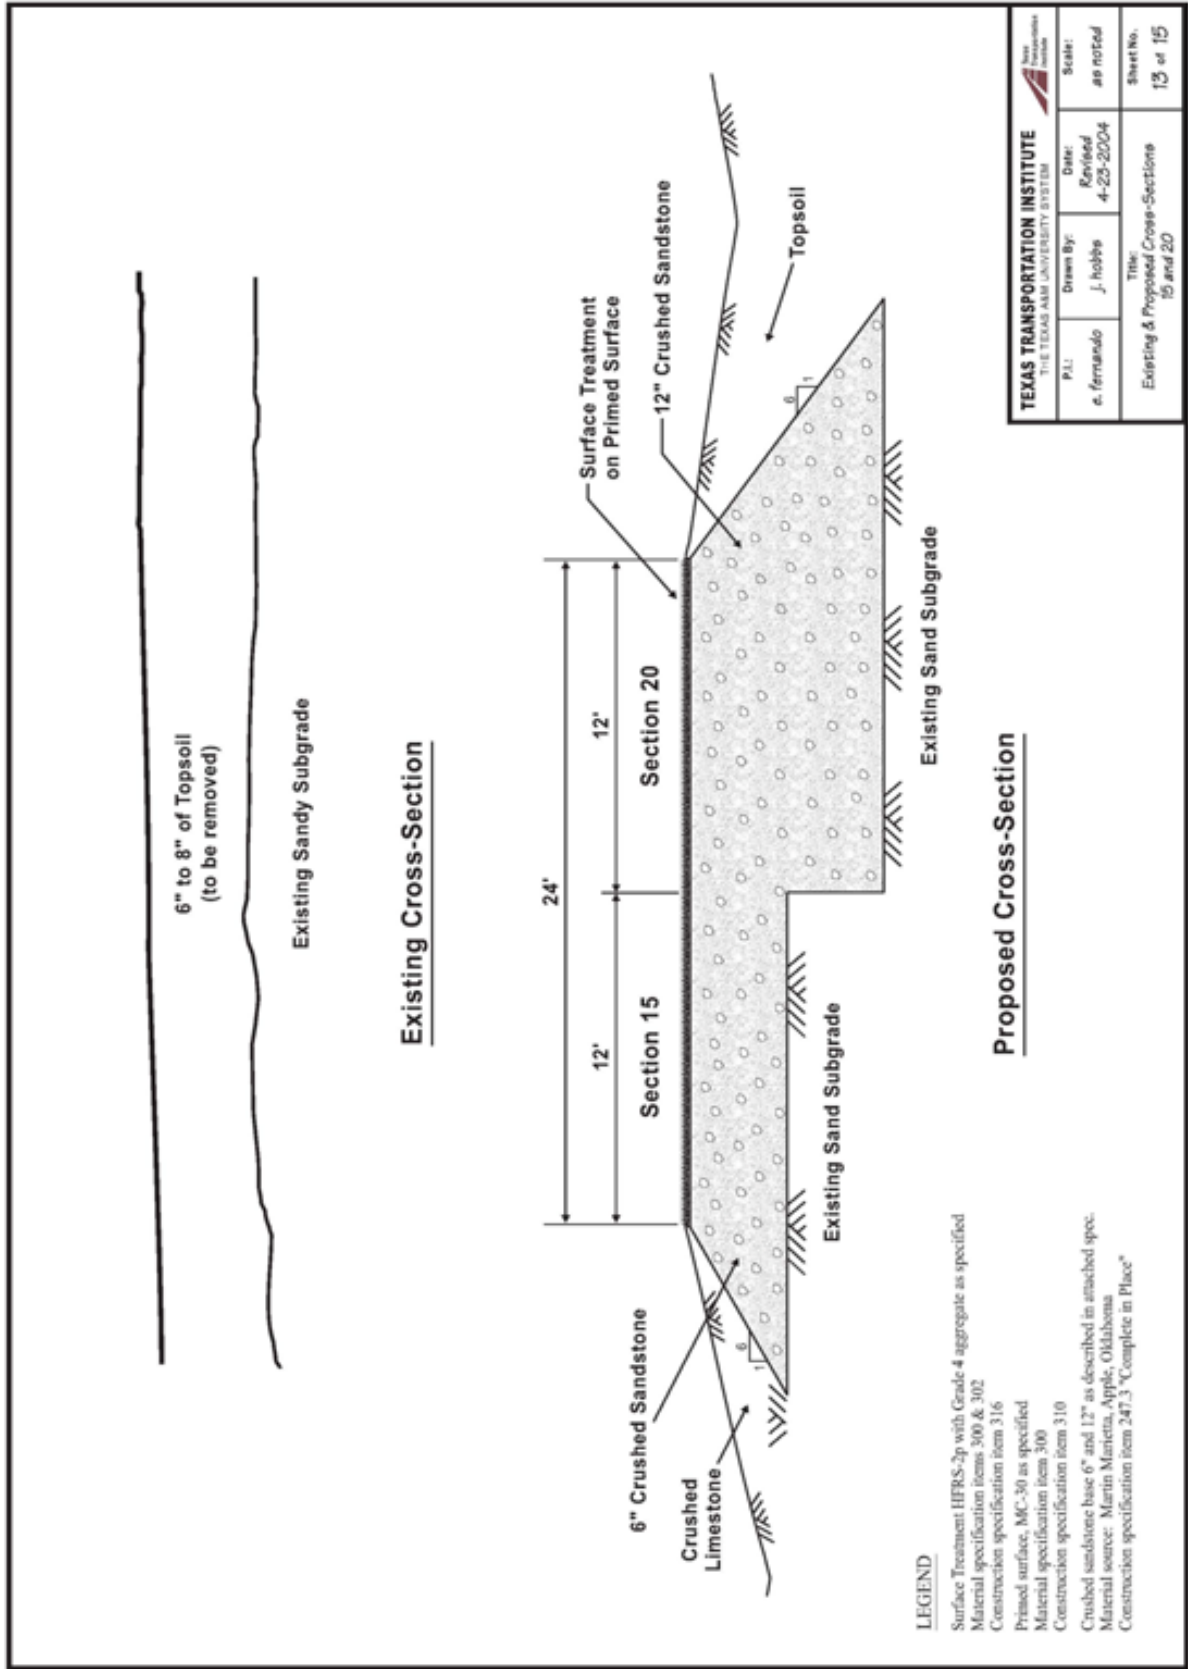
Existing and Proposed Cross-Sections for Sections 15 and 20.
